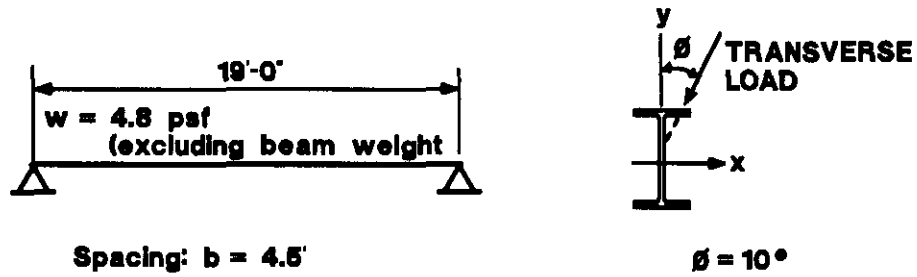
A-8(a) Beam configuration and loading, Example 5A-8(a)
